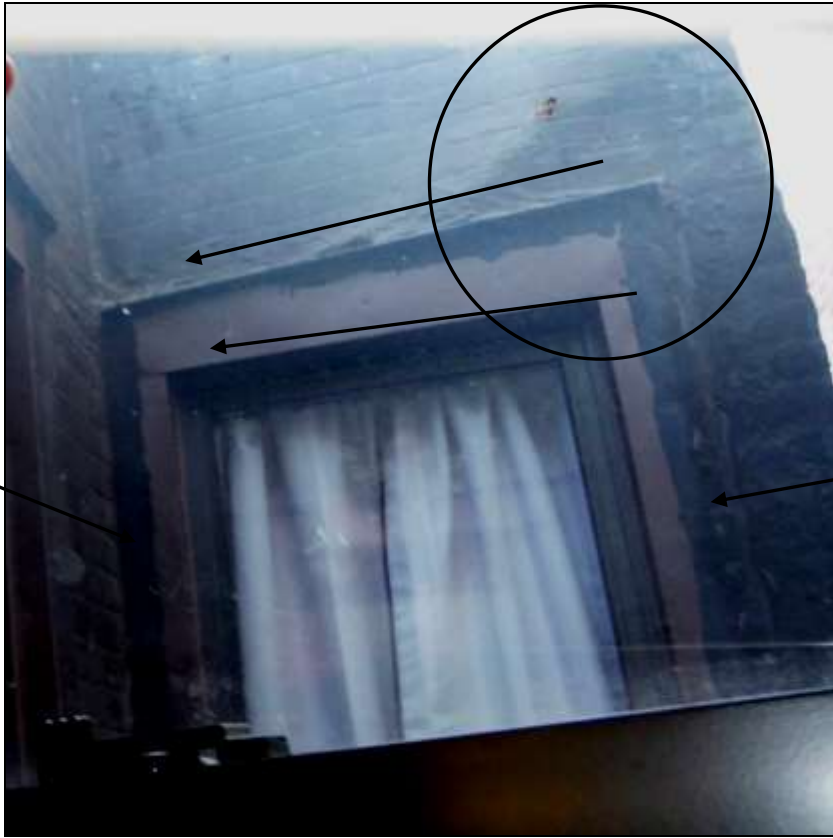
Buckled siding, canted windows, and tarring as viewed from apartment window.
